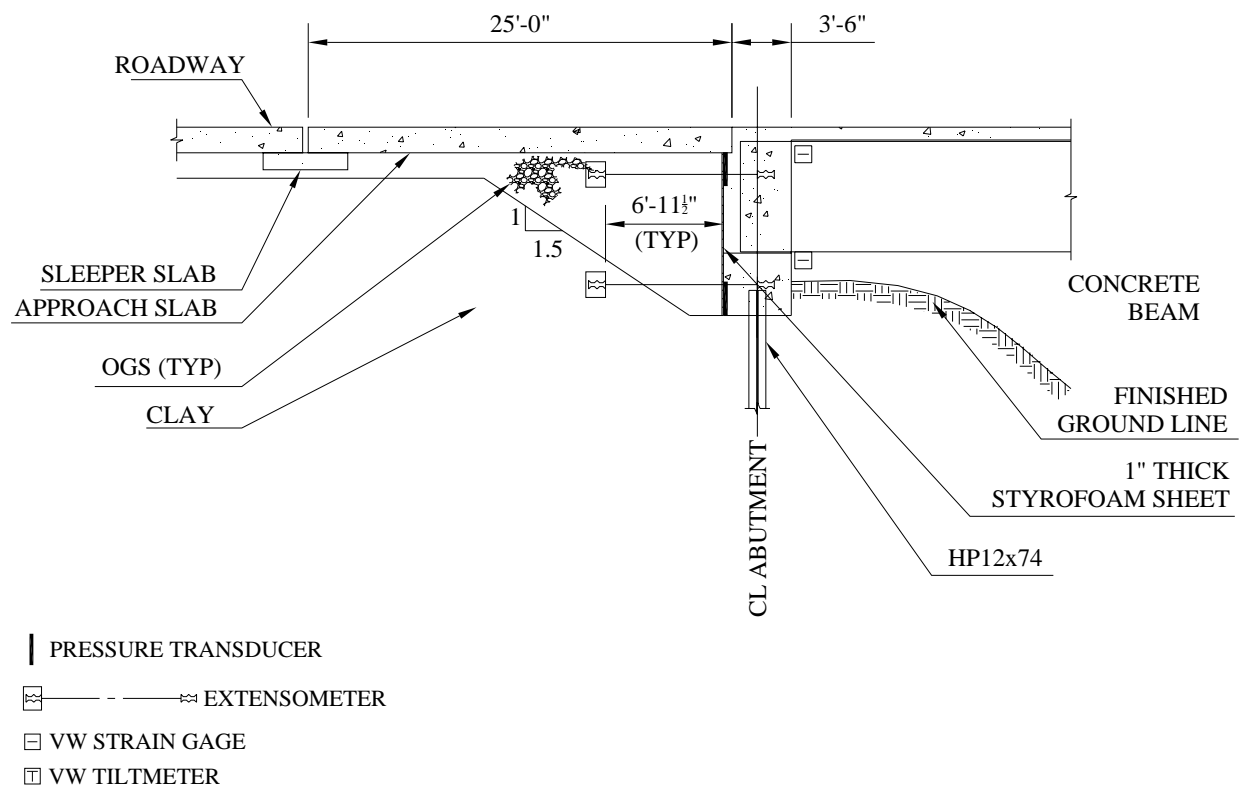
Structure 109 Cross-Section Through South Abutment (Section C-C).
